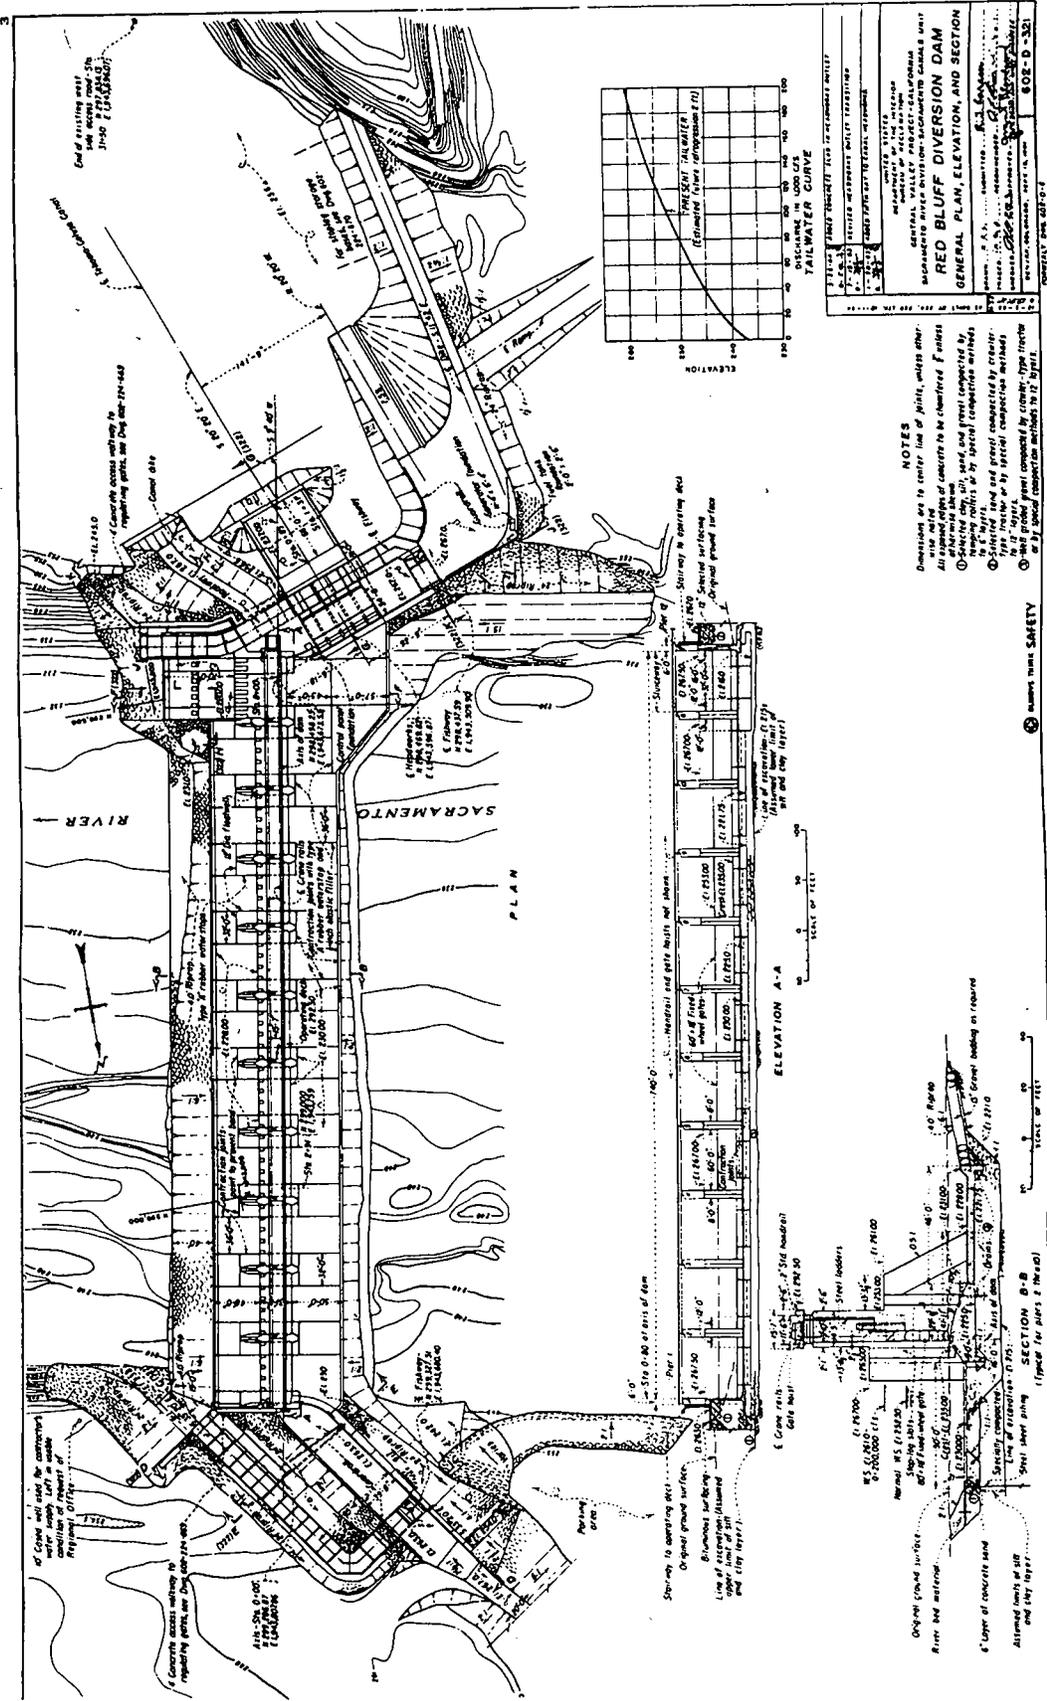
Plan and sections of Red Bluff Diversion Dam.
